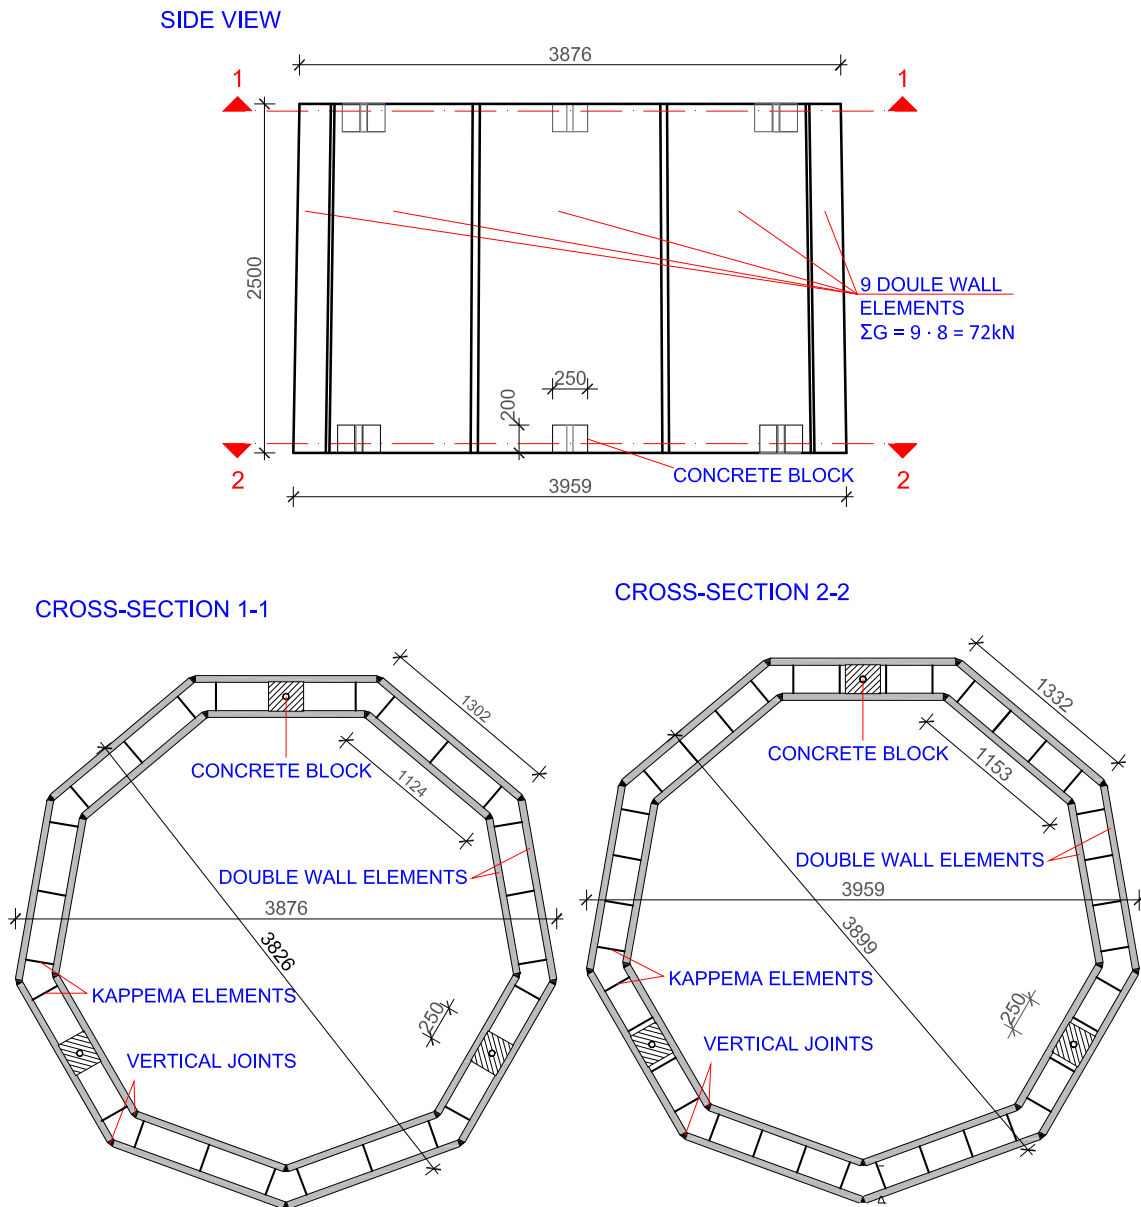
Mock-up segment: front elevation and characteristic cross-sections [mm]
